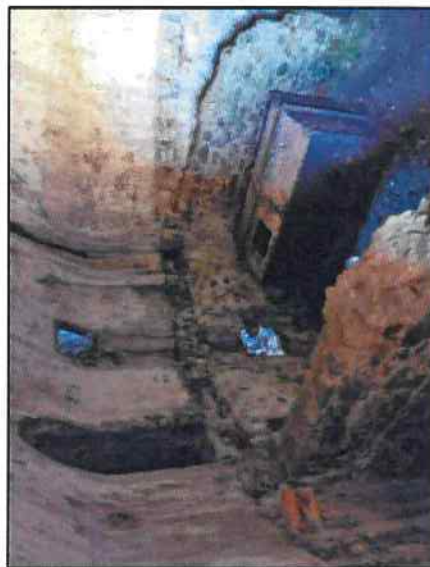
View of interior of tower, showing metal trunk and walls dividing undercroft
